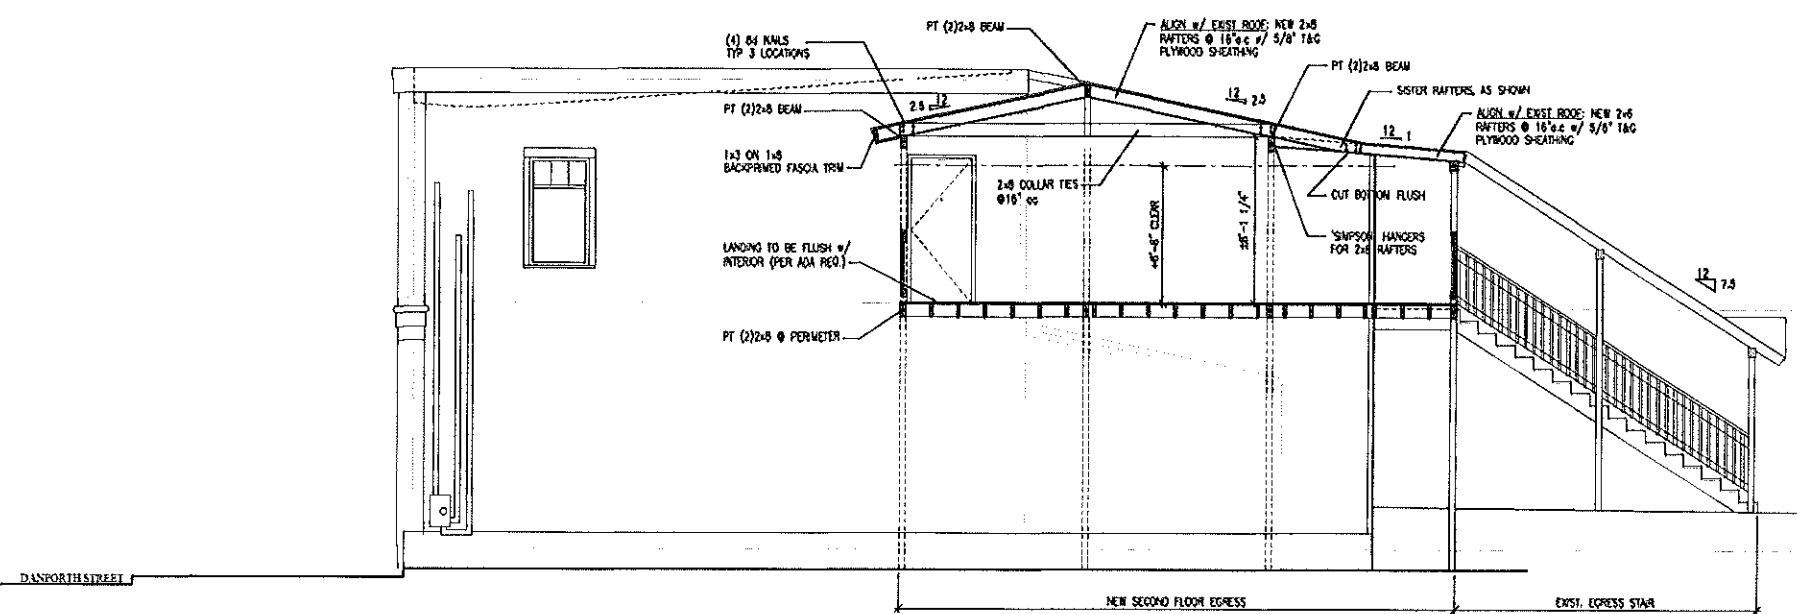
(a) Typical section view for building with two stories or more with fire-rated floor-ceiling assembly.
